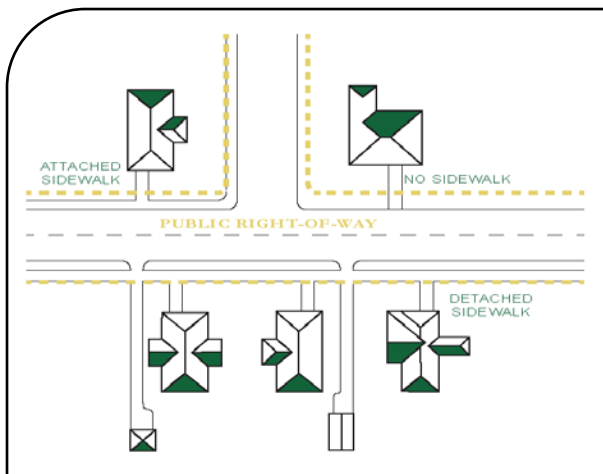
Diagram of typical types of sidewalk construction in the public-right-of-way.
